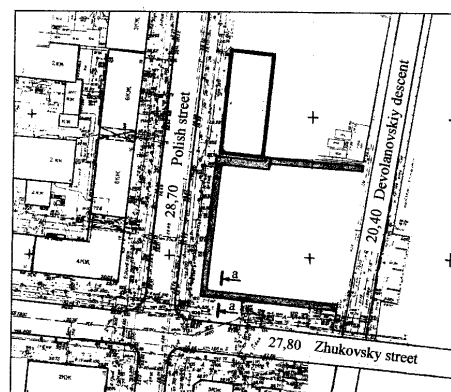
Situational plan of the site with the contours of the pile raft foundation of pit building under construction
